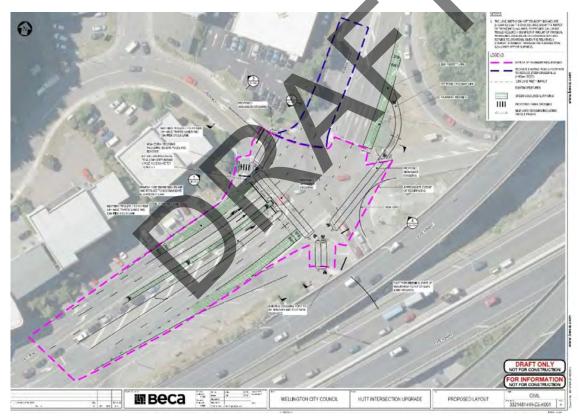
Specimen Design Diagram of the Hutt Road / Jarden Mile Intersection
